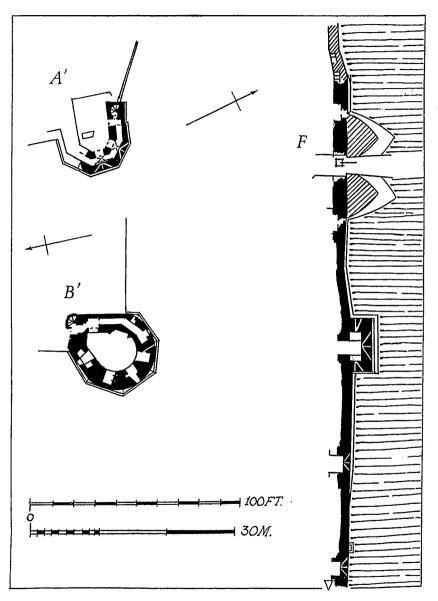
The northern Part of the Traverse to the Fitzwilliam Gate (F). Inset are upper Floor Plans of the Avranches (A') and Bell (B') Towers.
